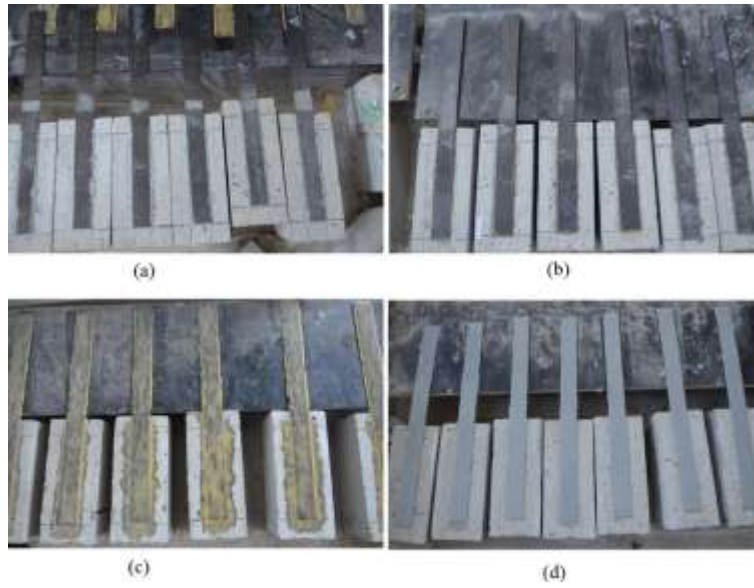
FRP bonded concrete joint specimens: (a) CP1 (b) CP2 (c) CS and (d) GS
